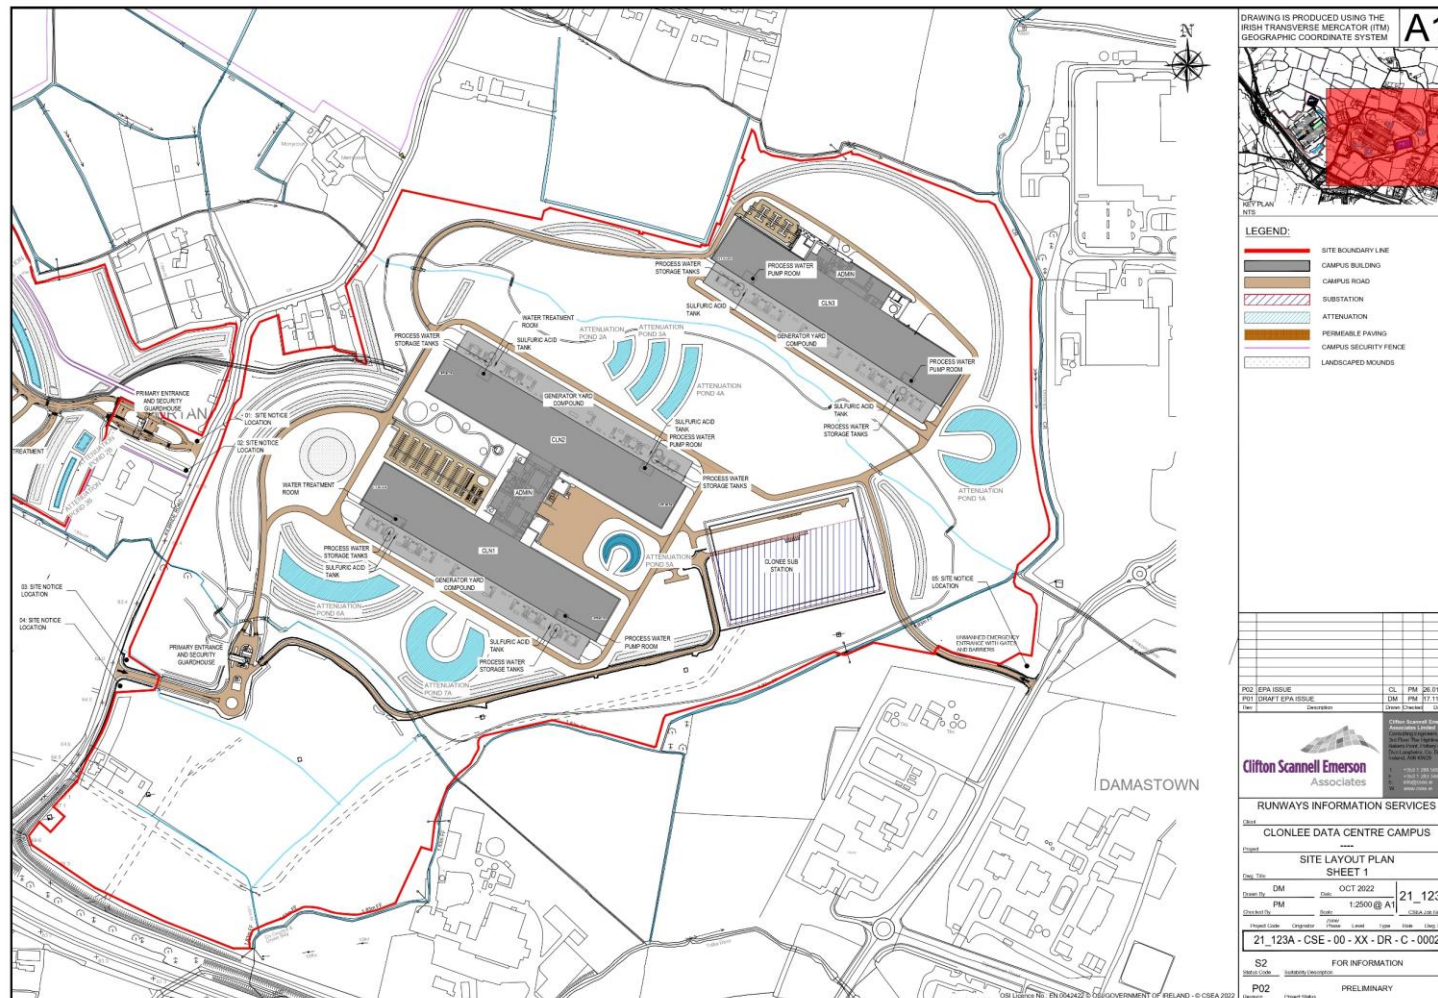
Plan showing redline boundary of the facility sheet 1 of 2
